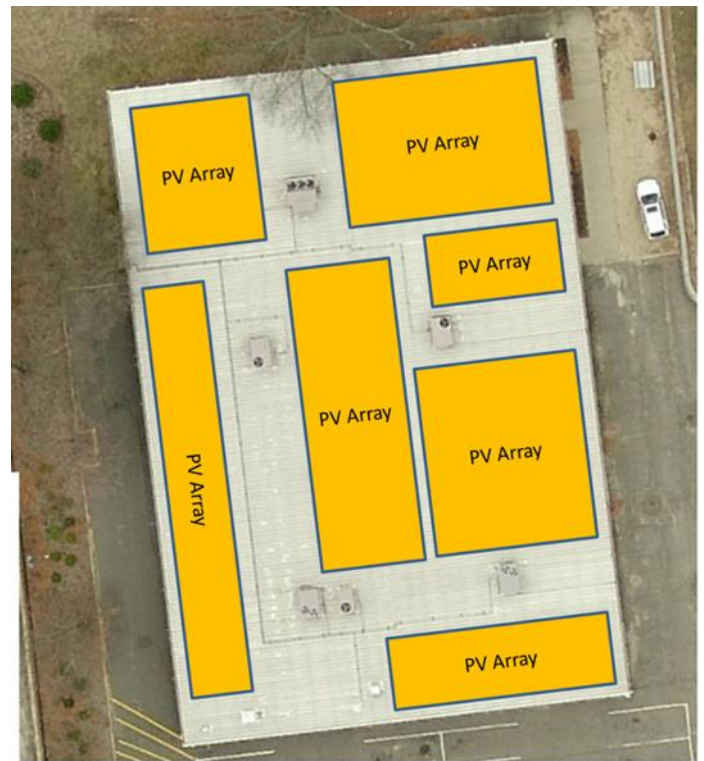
Roof of Lechtrecker Building with possible PV array arrangement.
